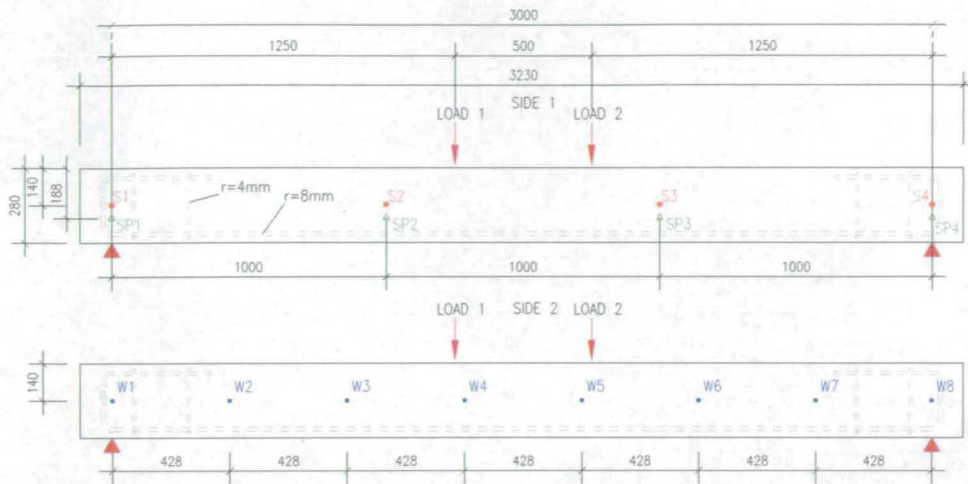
Design details, test configuration and sensor location (resonant: S1 to S4 - broadband WD type: W1 to W8 - SoundPrint: SP1 to SP4) of beam BF4.
